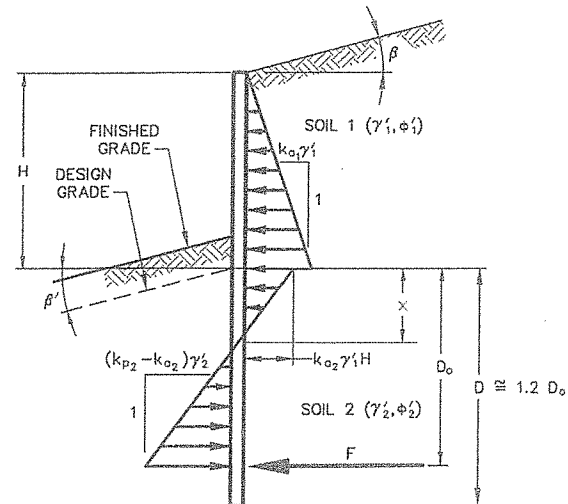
Unfactored Simplified Earth Pressure Distributions for Permanent Nongravity Cantilevered Walls with Discrete Vertical Wall Elements Embedded in Granular Soil
